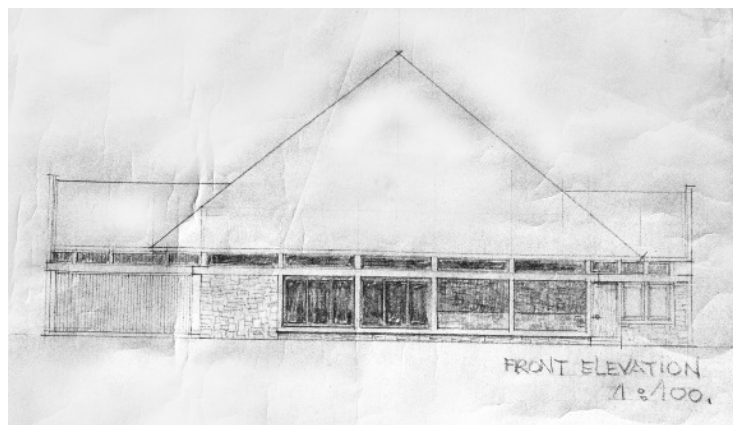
Front elevation of the initial plan of Residence of Lie A Hong (around 1969)²⁾
